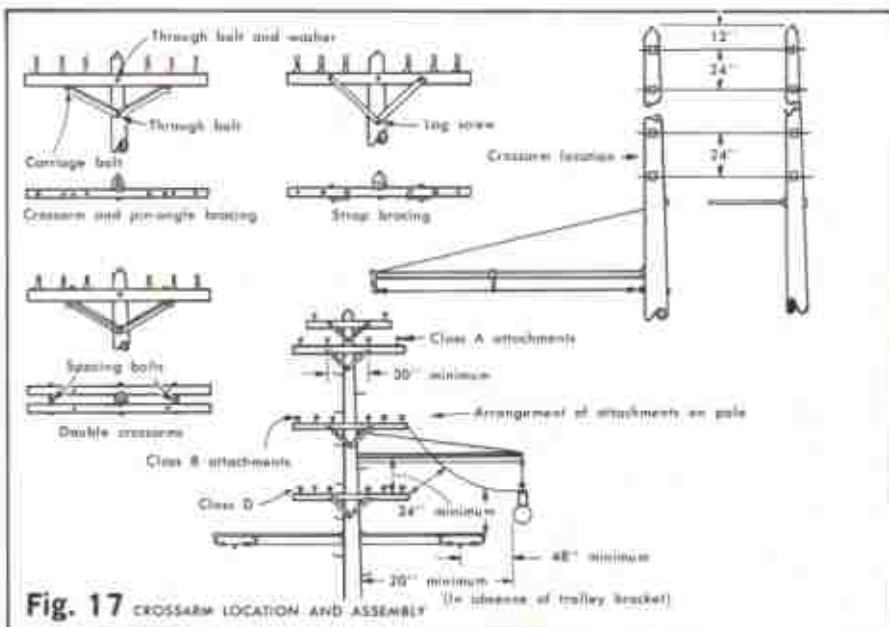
CROSSARM LOCATION AND ASSEMBLY
